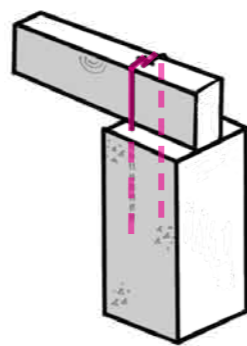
Reinforcement bar for tying timber to reinforced concrete column.
